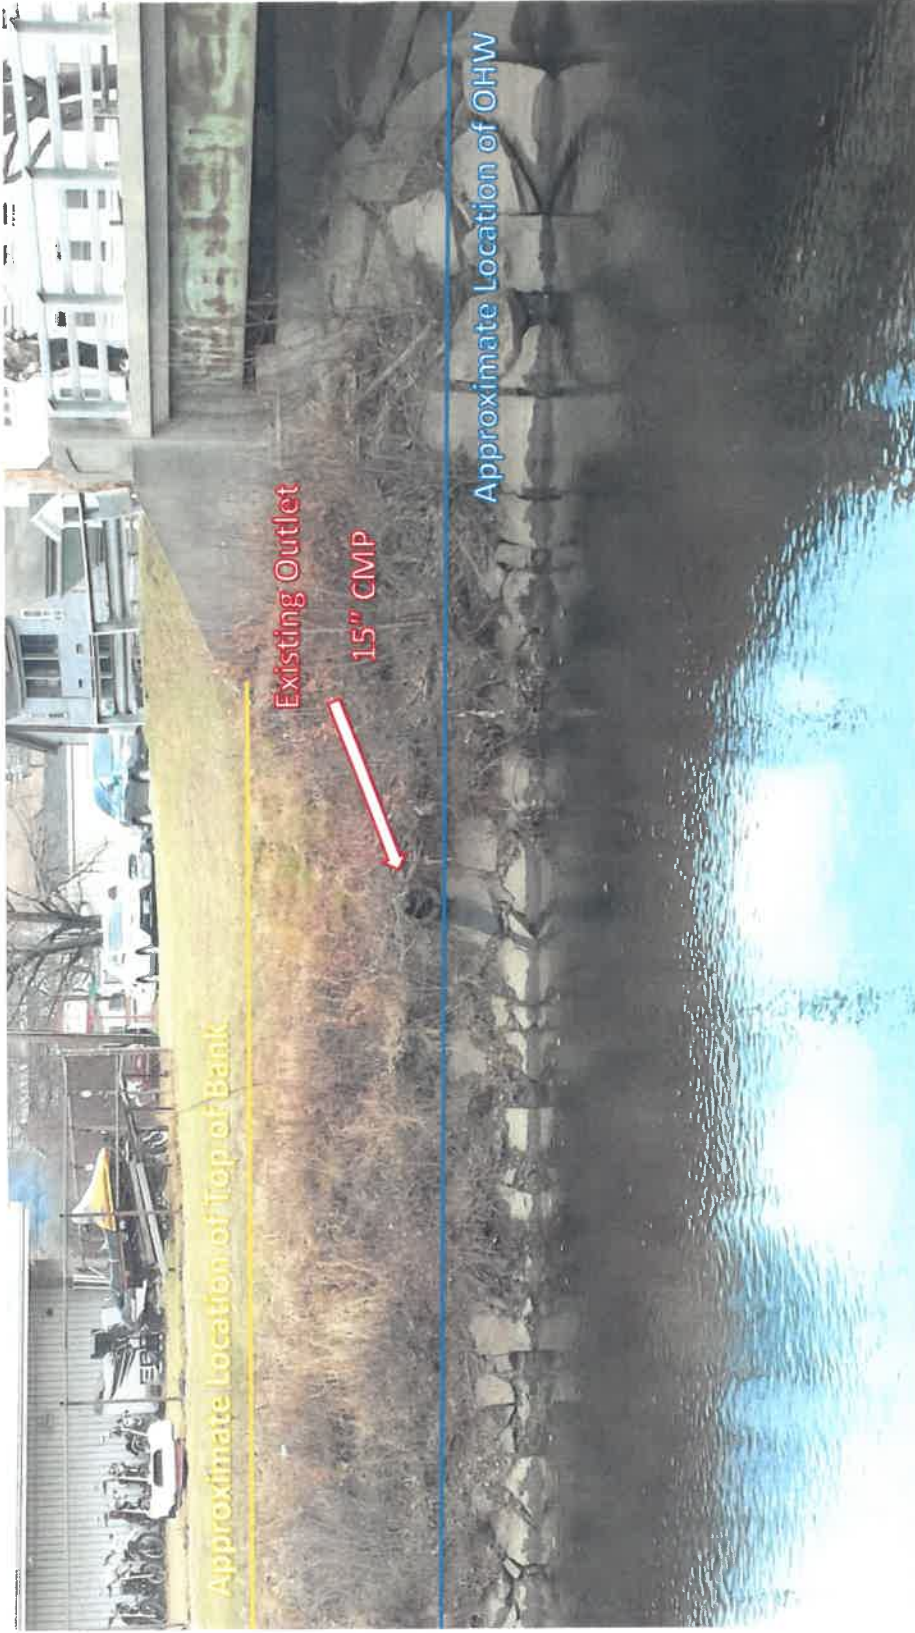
Drainage outlet Winchester Street Bridge over the Ashuelot River (Photo Direction: east)
